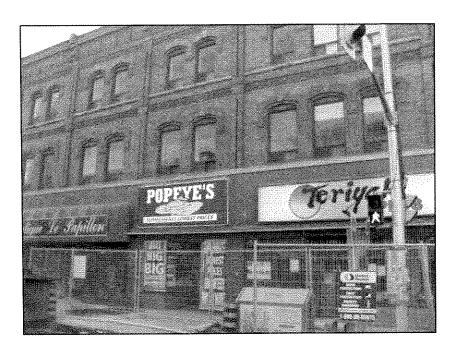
View of 132-138 Bank Street heritage building from Bank Street..
